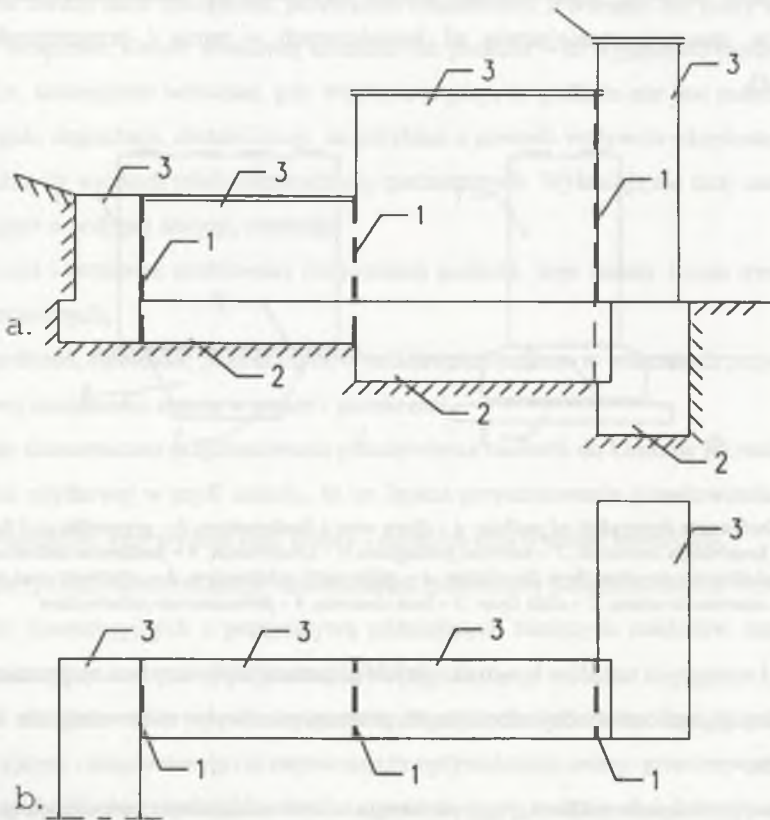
Insulating the structure from foundation: a – pillar with substructure, b – abutment over substructure,
